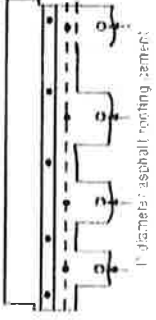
Fastening Presidential and Presidential TL Shake Shingles on Steep Slopes.
